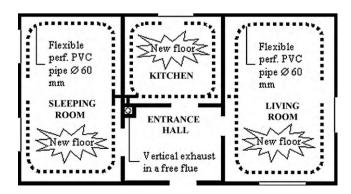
Group P–Flexible perforated pipes inserted into the drainage layer placed under the new floors sealed with a radon-proof membrane. Pipes are laid along the walls in order to stop radon from entering the dwelling through the wall-floor joint.
